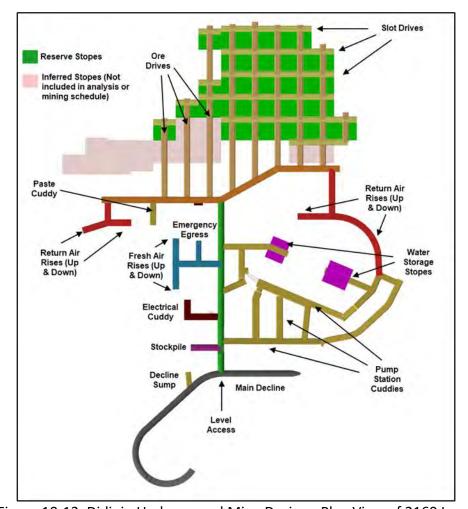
Didipio Underground Mine Design - Plan View of 2160 Level
